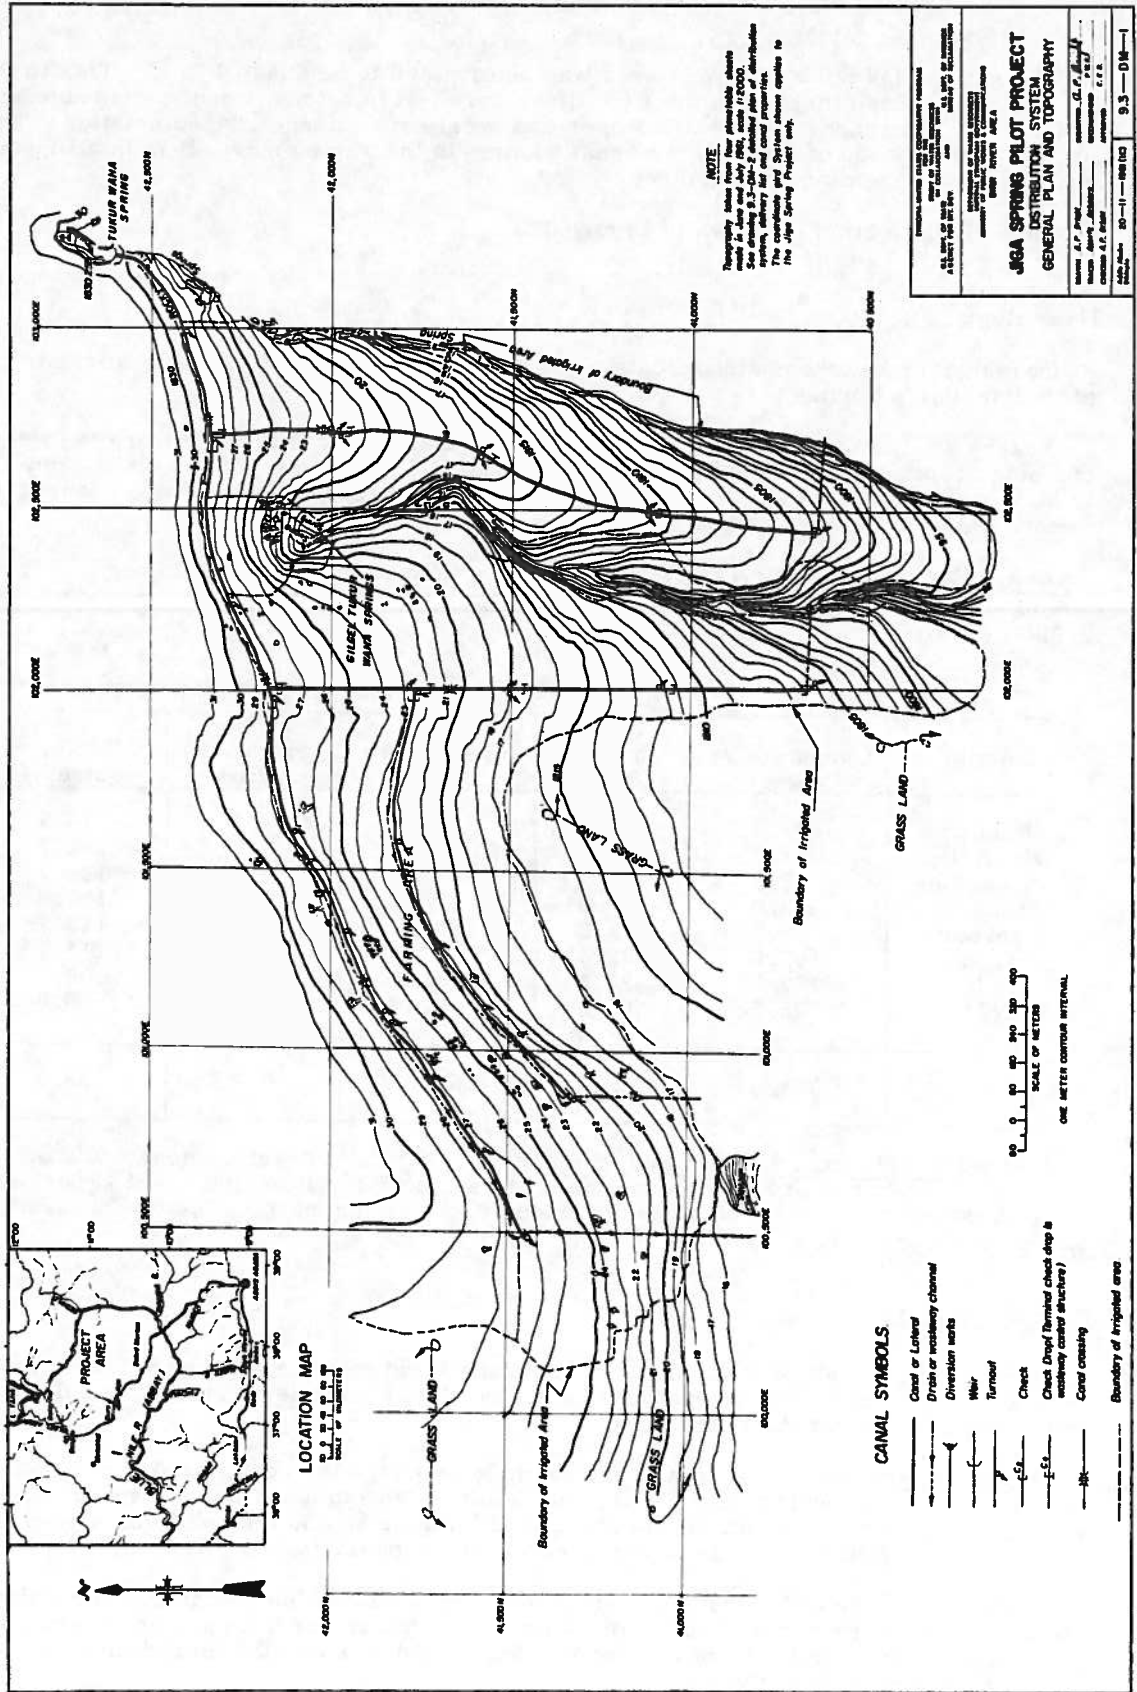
Jiga Spring Pilot Project--Topography and Plan
